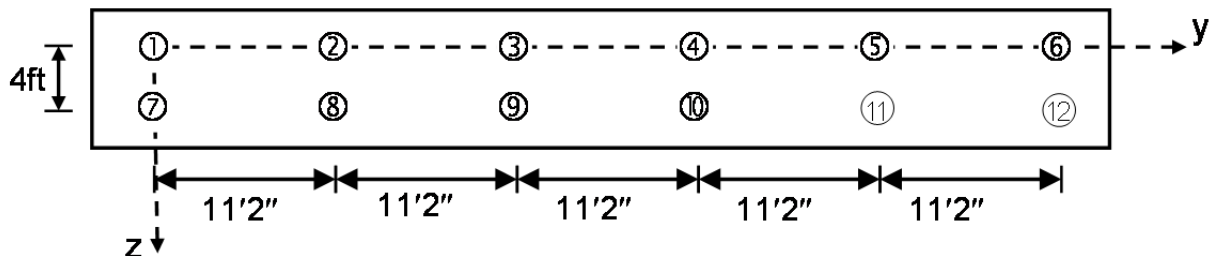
Schematic of pile group configuration for a single pile cap design at Pier A (59 ft × 7 ft pile cap)
